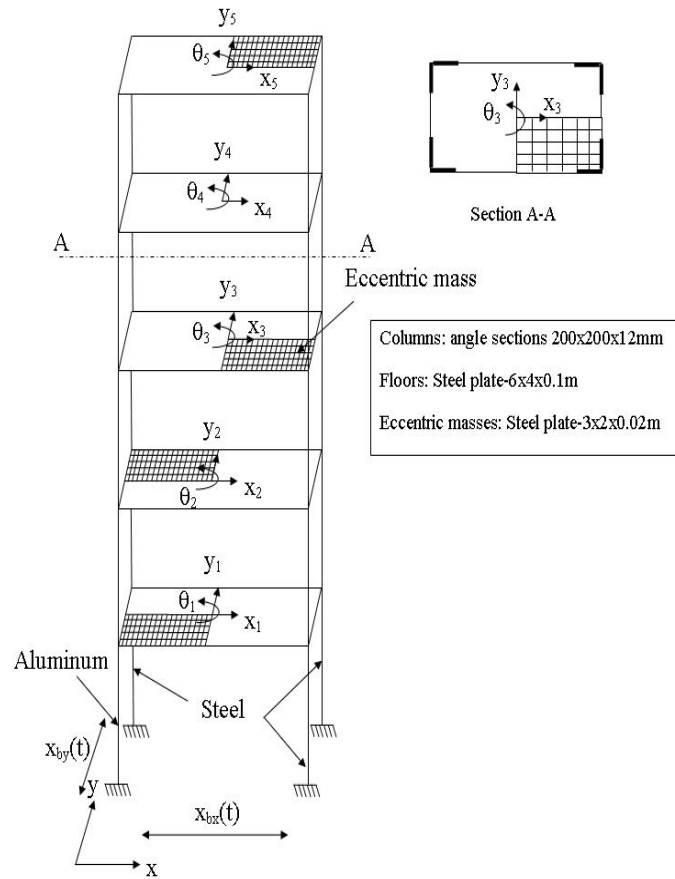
Example in Section 4.2; 5-storey shear frame building model
